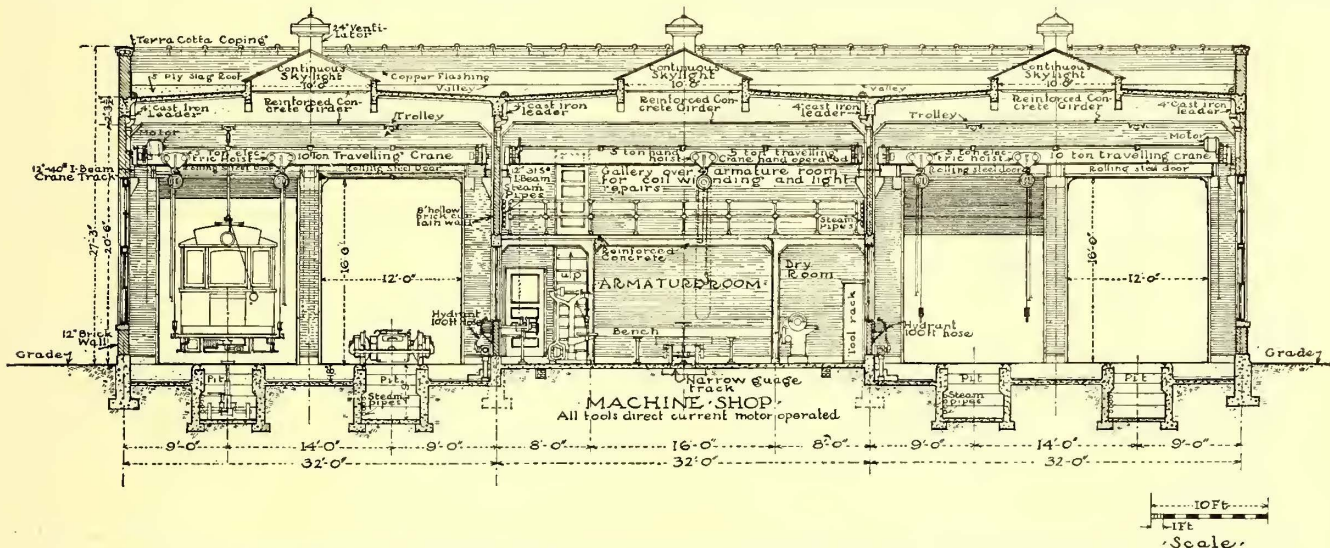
Model Car Shop Report—Transverse Section Through Machine Shop, Looking Toward Front of Building
